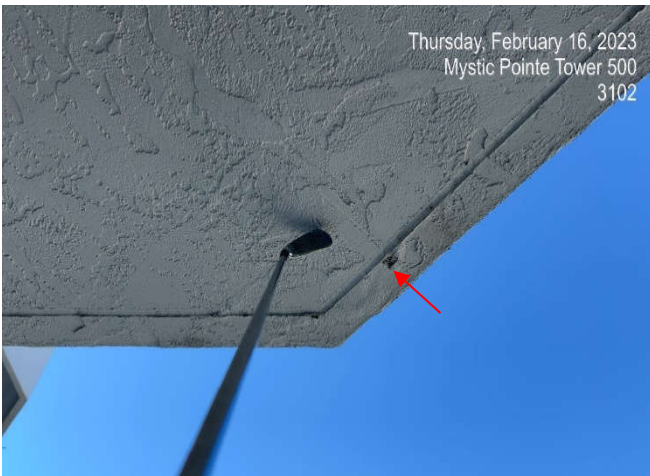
b.7 – Rust spot at the balcony ceiling (Unit 3102)
